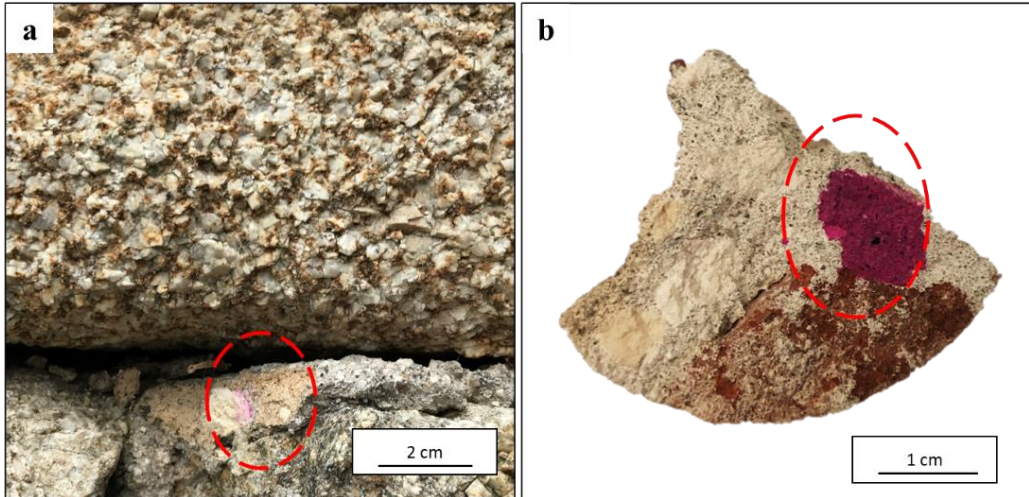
Phenolphthalein tests: a) in situ on masonry; b) in laboratory on a sample.
